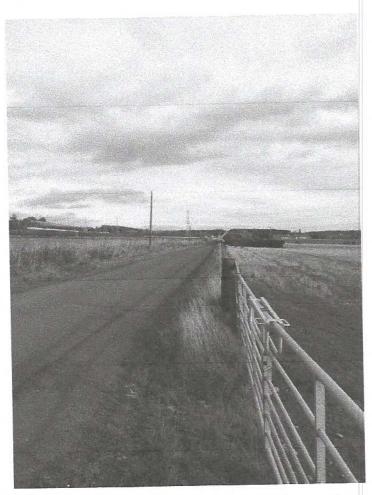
Looking 215Metres in Easterly direction, towards Memus, from access to proposed site
